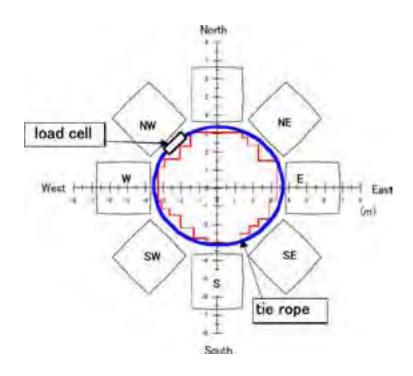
Tie rope around Central Tower, Bayon.
